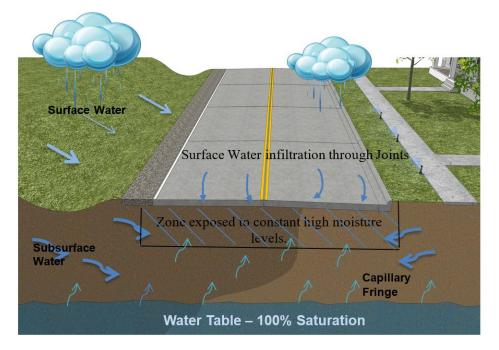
Concrete pavement exposed to surface and subsurface moisture conditions
